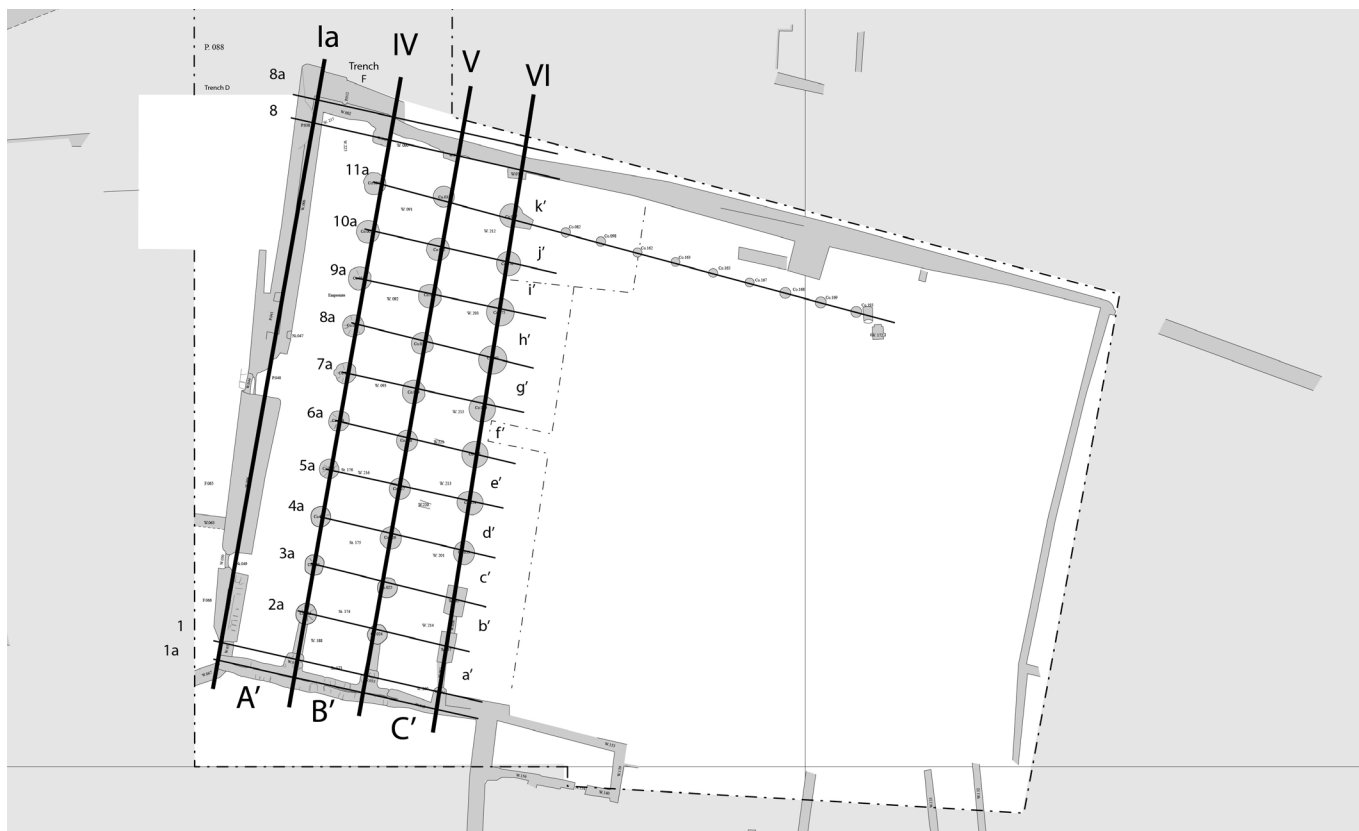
Al-Yamāma. Plan of Building 1: Numbering of pillar lines, naves and rows of Building 1, built above floor F. 015 (Ch. Darles, M. Niveleau, J. Schiettecatte - Saudi-French archaeological mission in al-Kharj).
